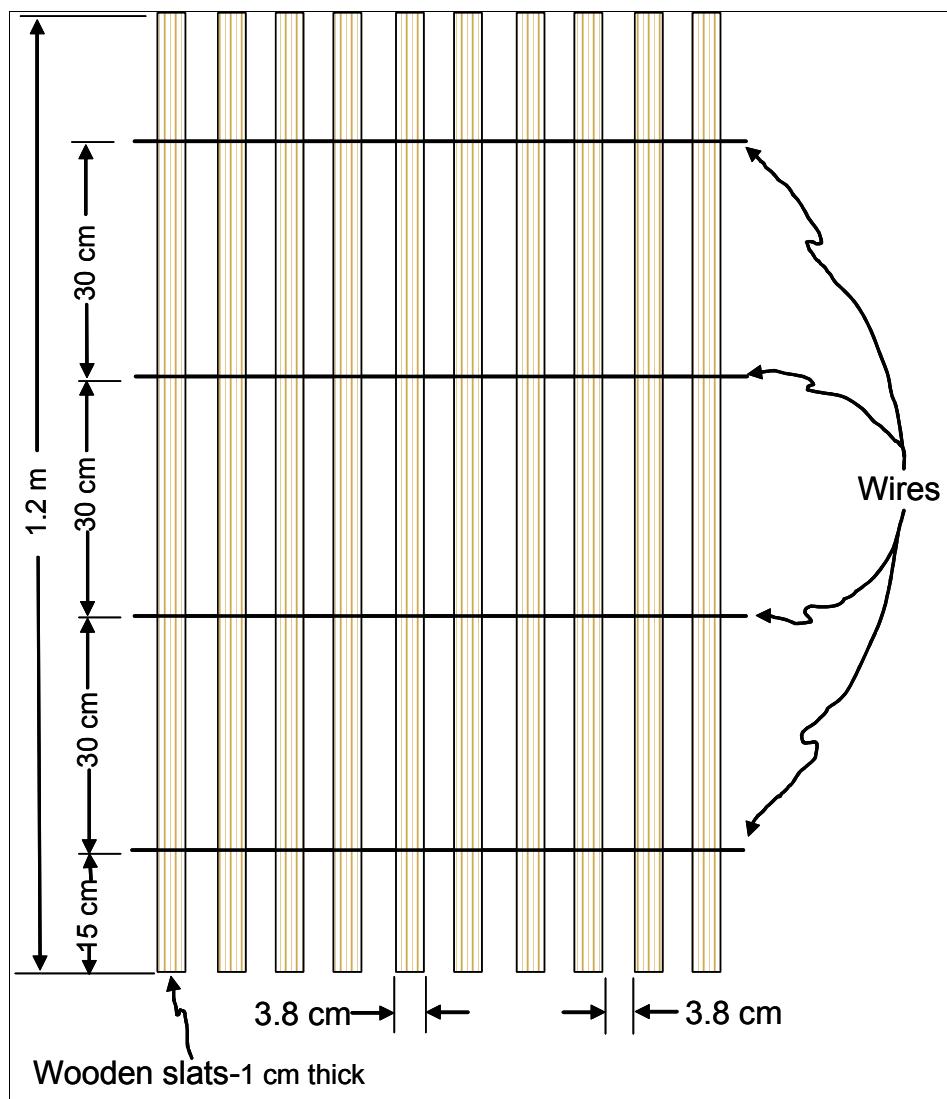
Schematic diagram of typical sand fence design (after Woodhouse 1978).
